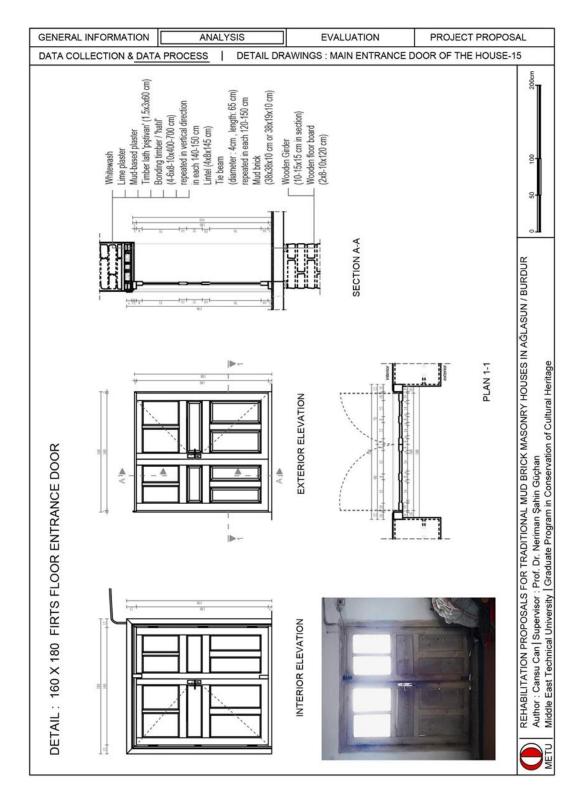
Detail Drawings of First Floor Entrance Door (House-15)
